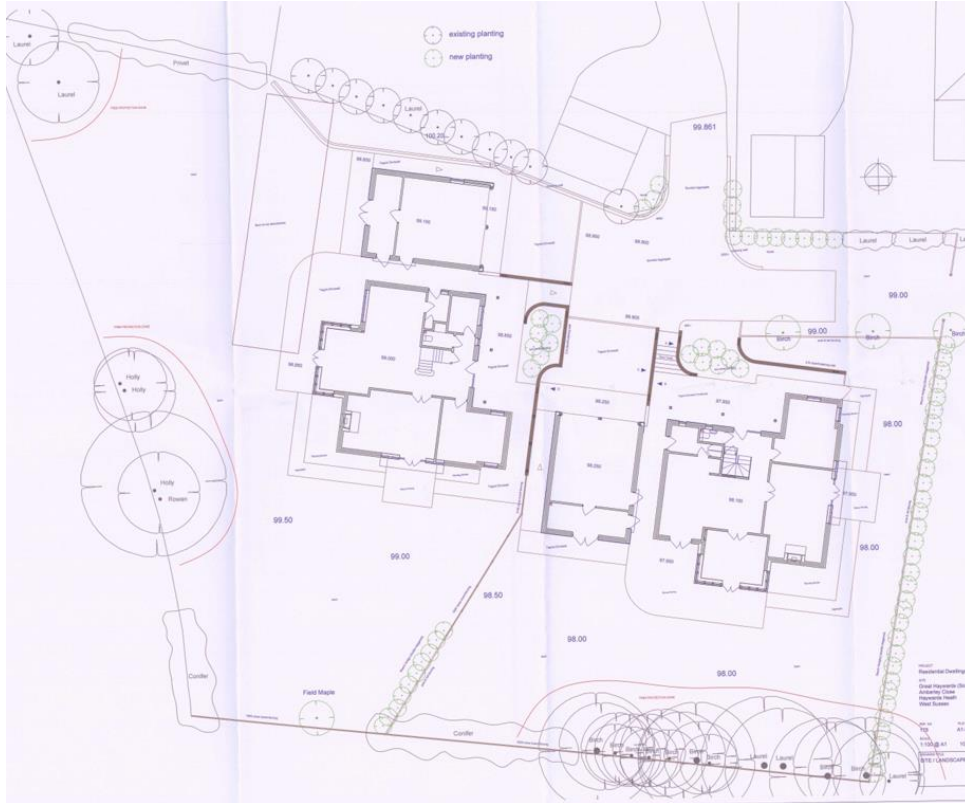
Refused Block Plan (ref: 10/02585/FUL)
